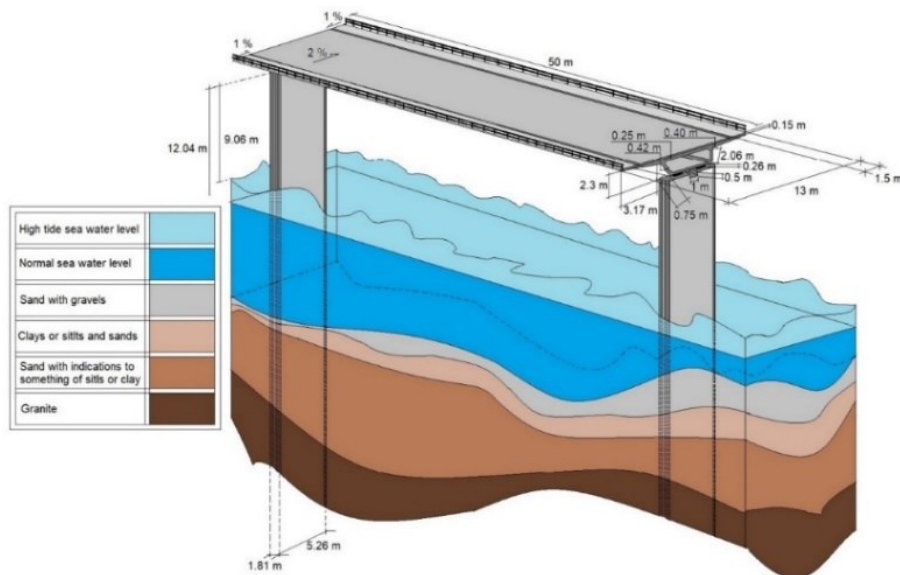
3. *The measurements of the deck and columns of the central section of the Arosa bridge.
